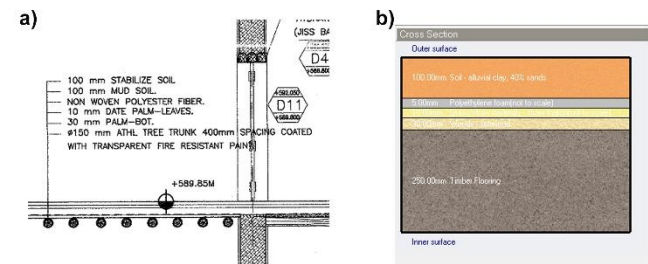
First floor layer: a) as built detail, b) design builder data entry ground layer.
